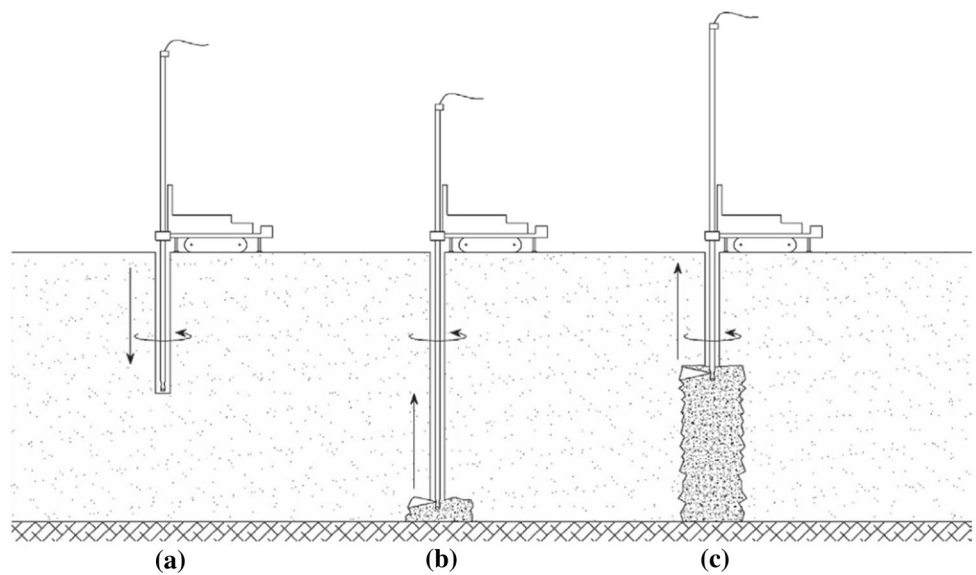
Typical jet grouting procedure: a drilling, b, c jet grouted column formation [30]
